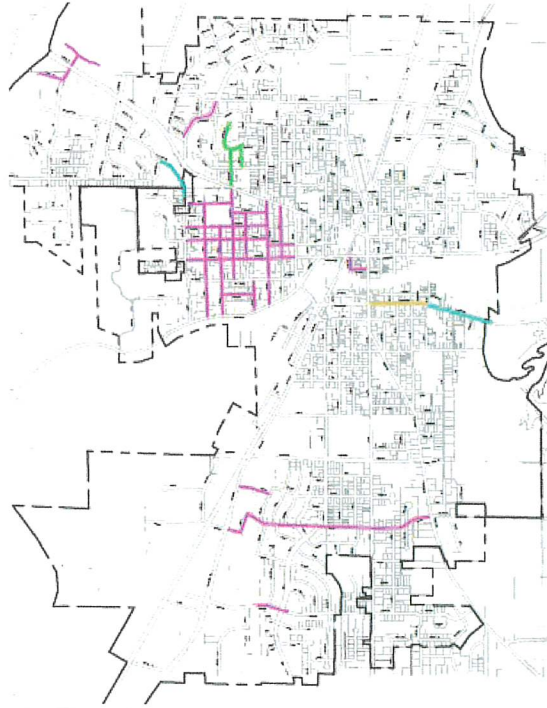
MAGENTA – crack fill (+/- 6 miles) GOLD – mill and resurface (+/- 0.5 miles) BLUE– pulverize and pave (+/- 1 miles) GREEN– reconstruction & utility replacement (+/- 0.5 miles)
